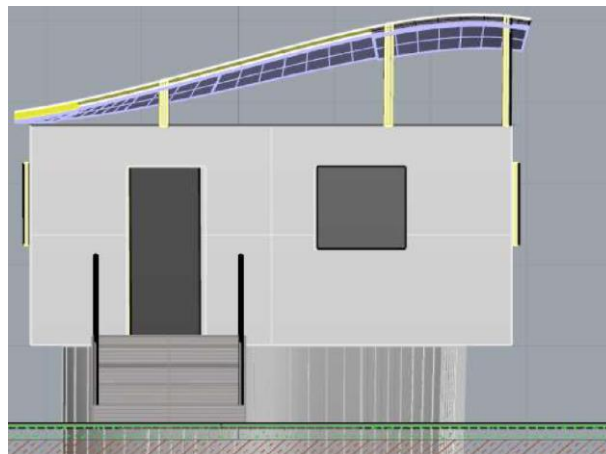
Blade with ‘fillet’ cut, used as roof section (Bank et al., 2019)
